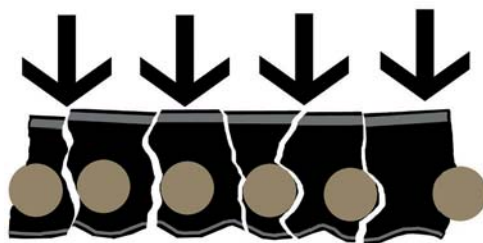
Collapse caused by the weight of falling roof timbers on the upper surface.
